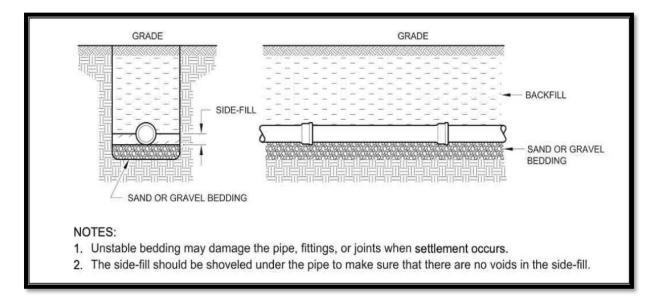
Open Cut Trenching bedding and backfill requirements. Source: https://up.codes/s/trenching-bedding-tunneling-and-backfilling
